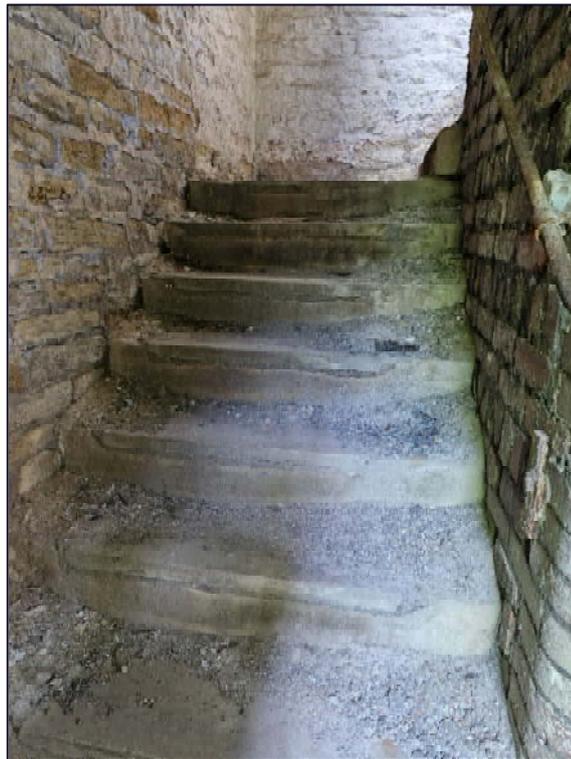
Detail of stone steps in the stair tower, rear of Mill 6 and 7
